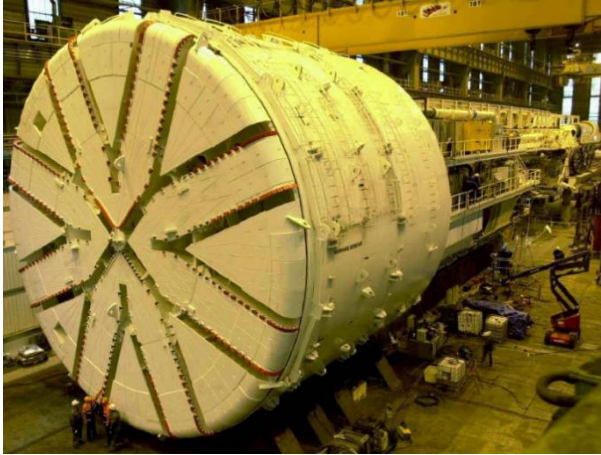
Slurry TBM used in the Green Heart Tunnel (TEC, 2014).
